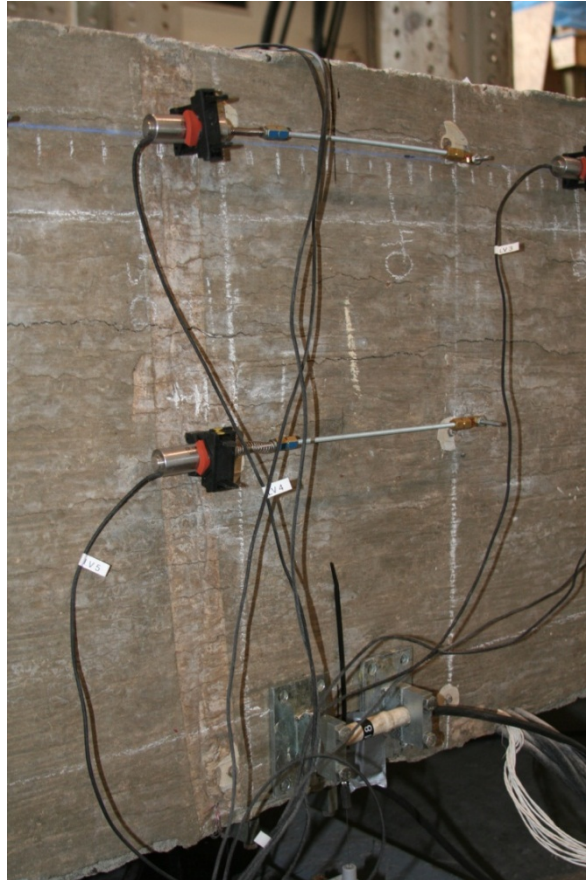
Cracking of Specimen #8 prior to Structural Load Testing.
